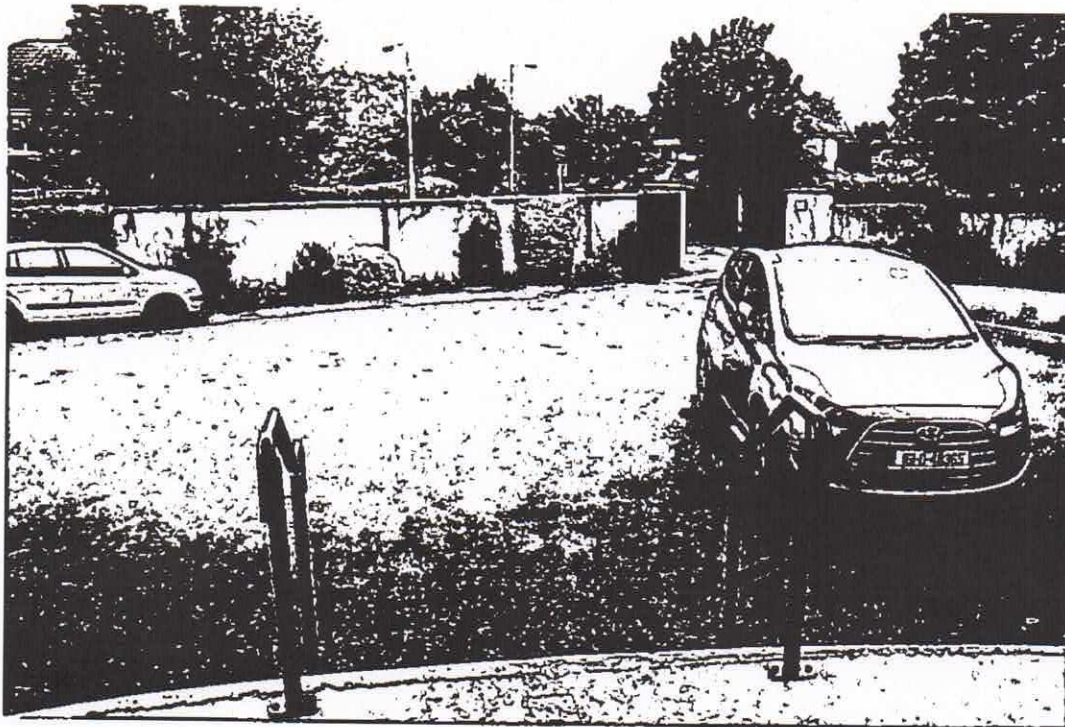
View looking south from the main building entrance to the existing vehicular entrance. This area is to be retained as is with surfaces made good where required.
